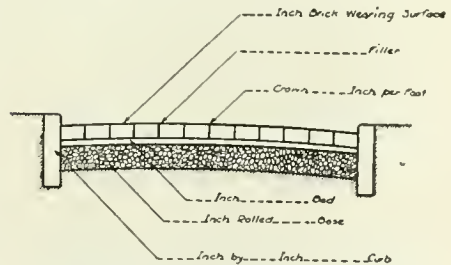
AN ADAPTION OF THE ROLLED-BASE TYPE OF BRICK PAVEMENT IN CITY STREET CONSTRUCTION.
